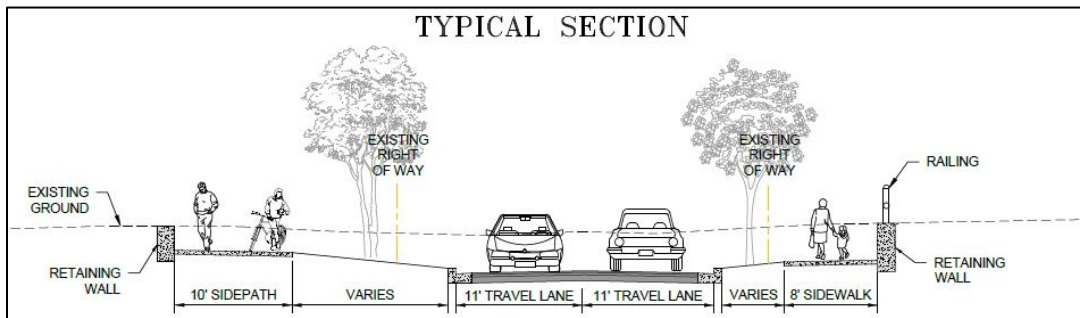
North High Street Extension Alternative 2 – Cross Section west of McDonalds
